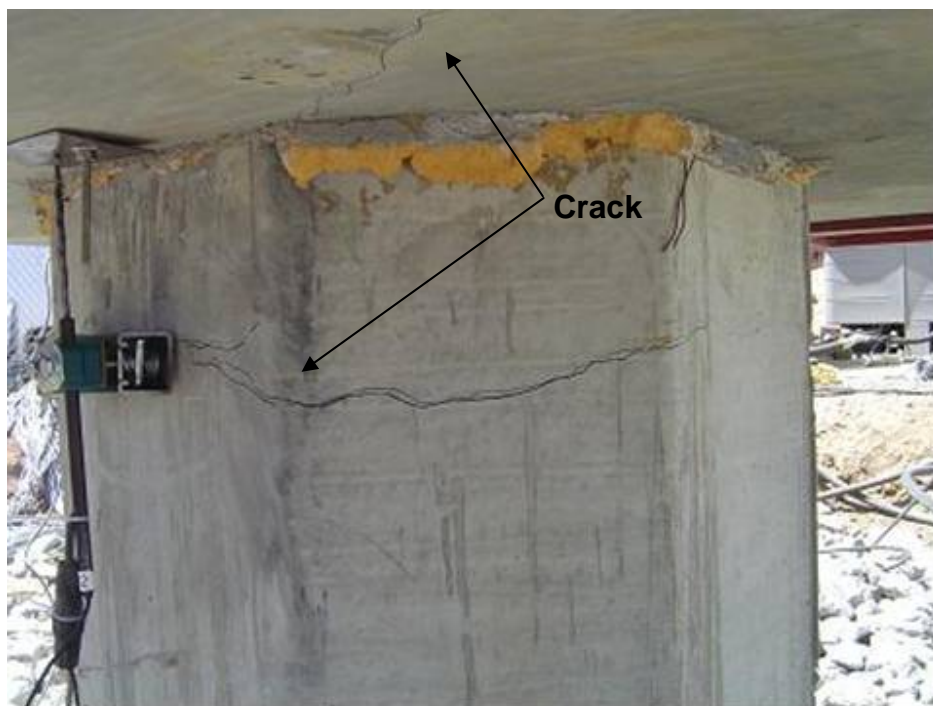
Cracks at P3 for loading Cycle 3 (System Test 1)
